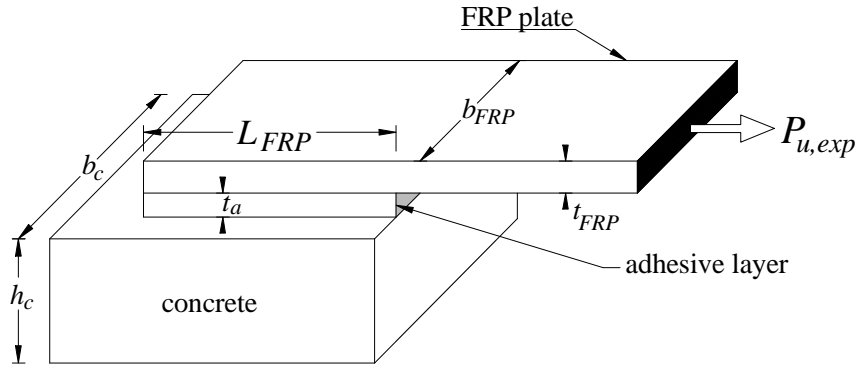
Geometrical and loading configuration of FRP concrete bonded joint.
